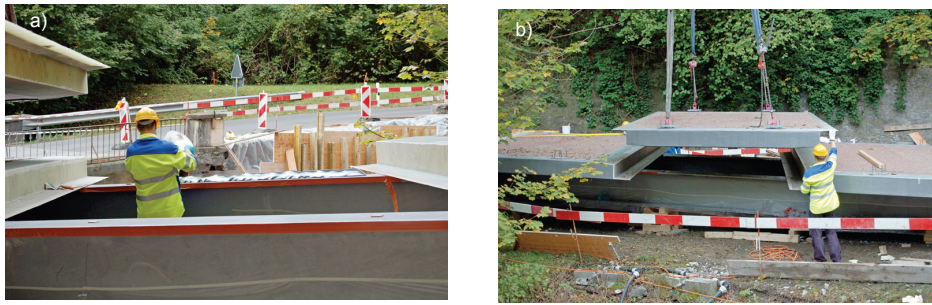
Avançon bridge in Vaud, Switzerland, 2012: a) Adhesive application on steel girder; b) Installation of middle deck panel before injection (photos, Thomas Keller).
